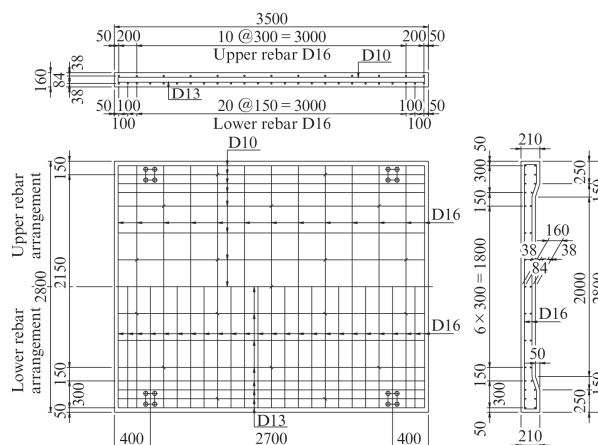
Size and dimension of concrete slab for wheel load running fatigue test
